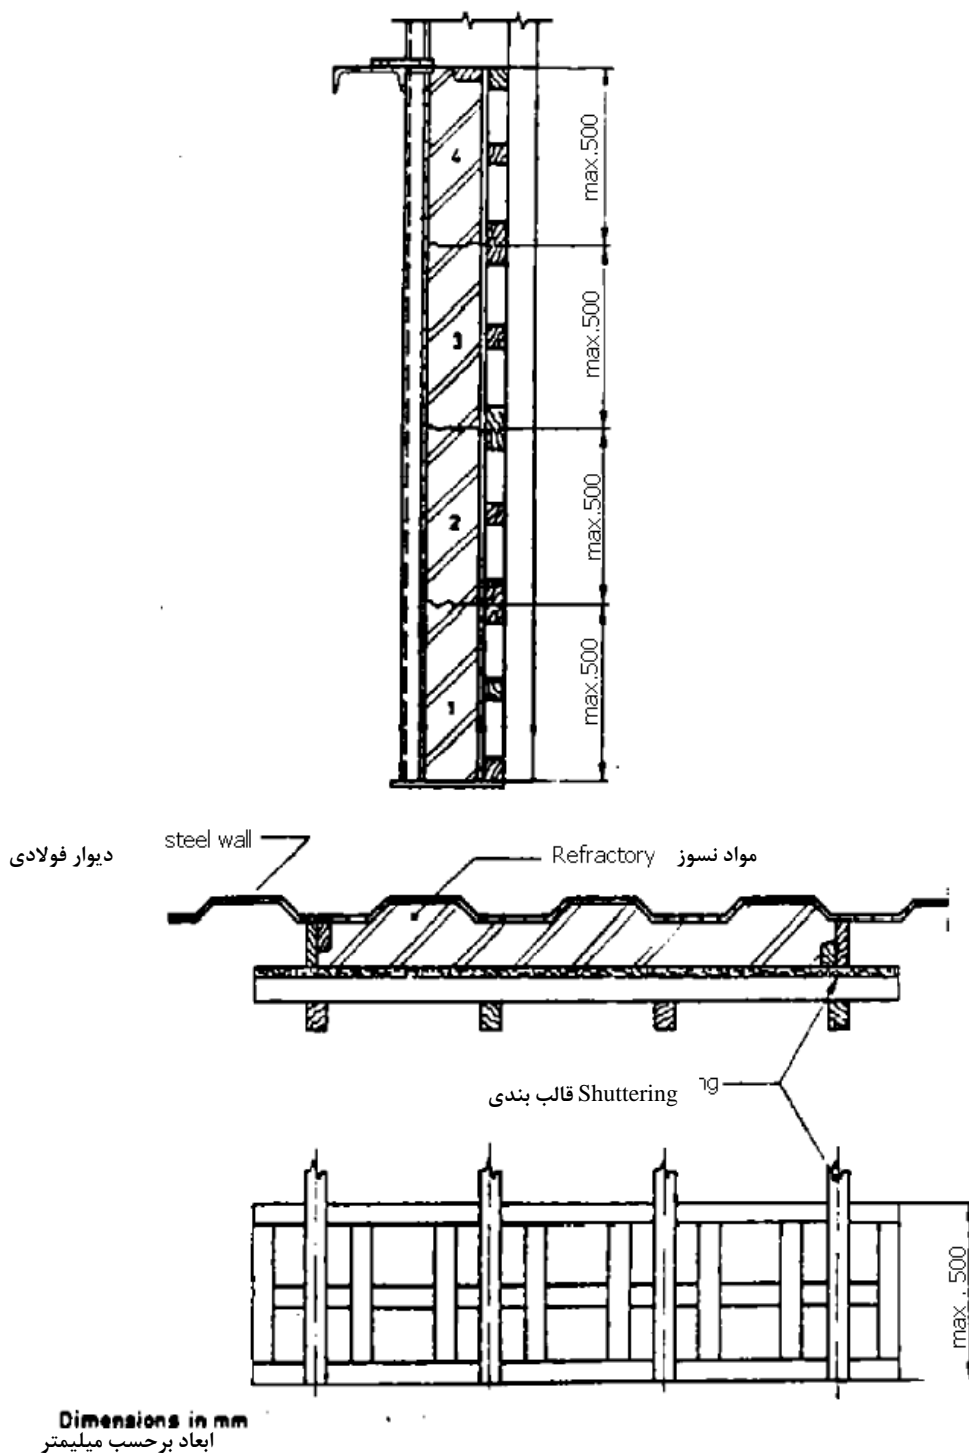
HORIZONTAL CASTING INSIDE PRE-ASSEMBLED PANELS (ANCHORING NOT SHOWN)
